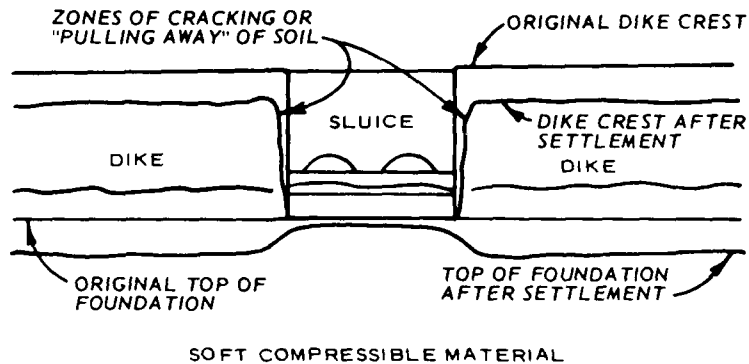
Cracking at dike-structure junction caused by differential settlement caused by dike load on foundation being much greater than sluice load
